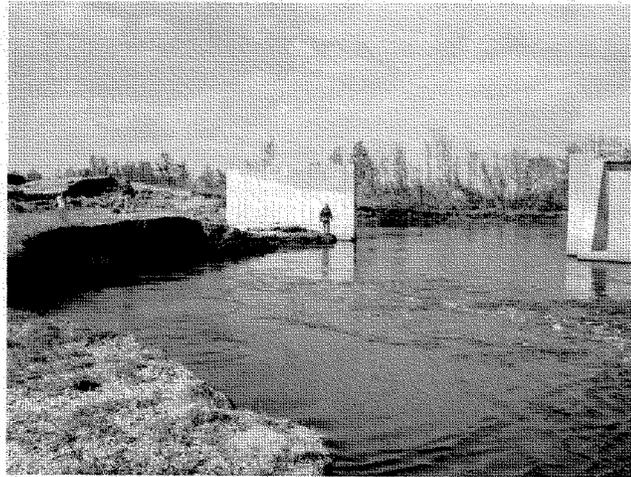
Ground perspective of Bayou Dupree gate abutment failure (L. Wooten, October 6, 2005).
